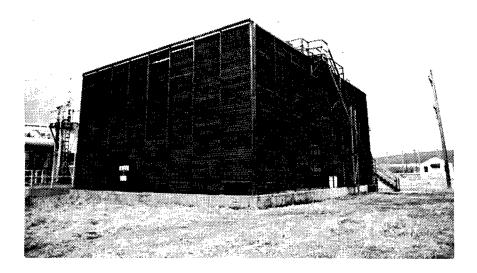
Building 2522: Solvent Recovery Cooling Tower.
